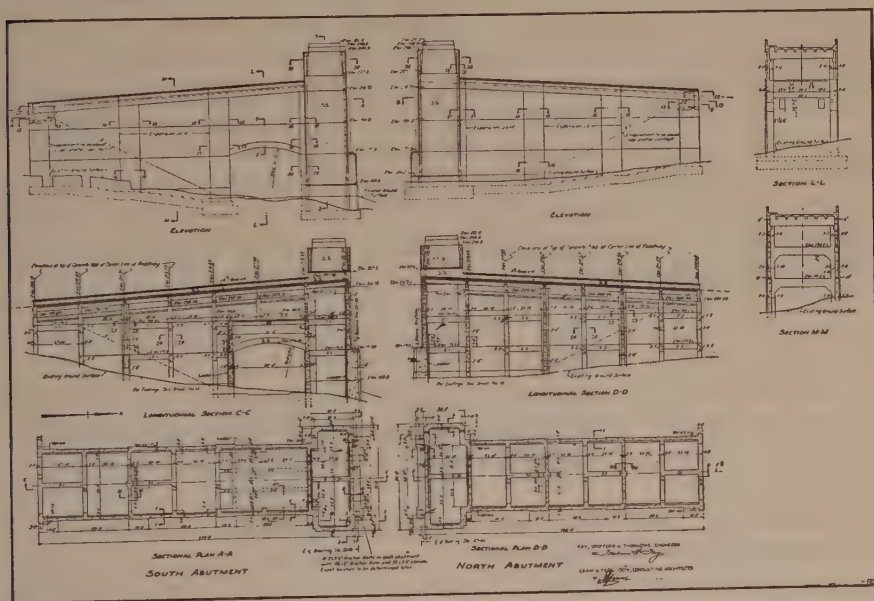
ABUTMENT ELEVATIONS AND SECTIONS OF HIGHWAY BRIDGE AT SAGAMORE
